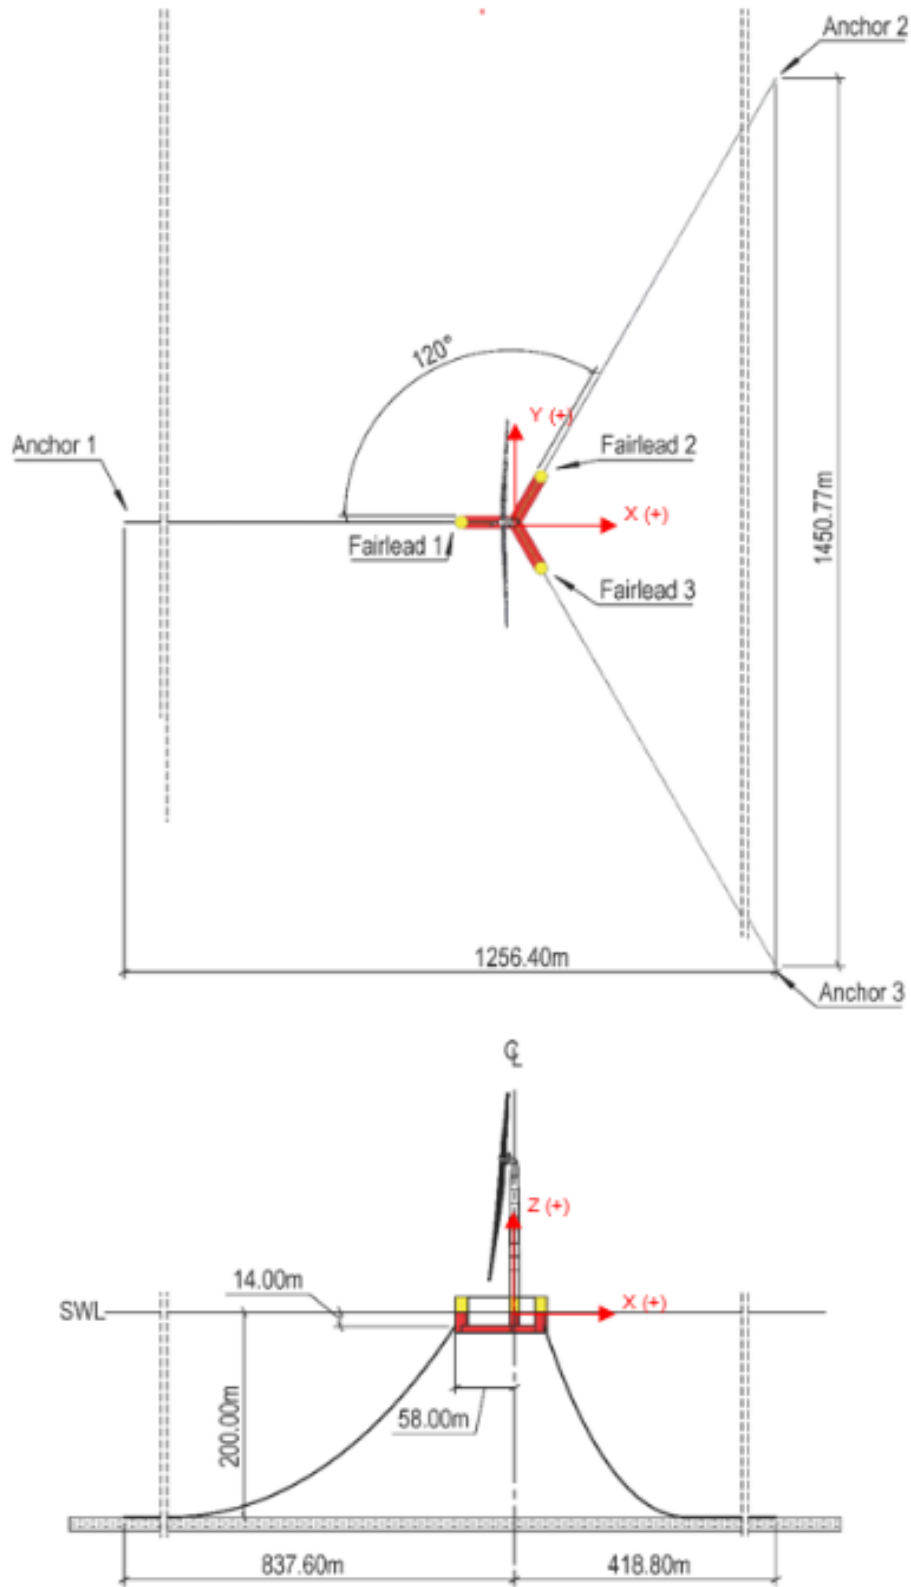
Mooring system arrangement within the inertia frame shown in plan (top) and elevation (bottom) views [2]
